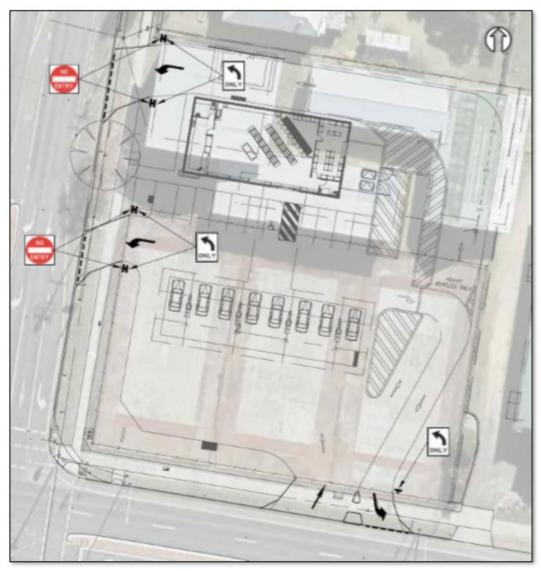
Proposed signage plan, prepared by PTT Traffic and Transport Engineers
